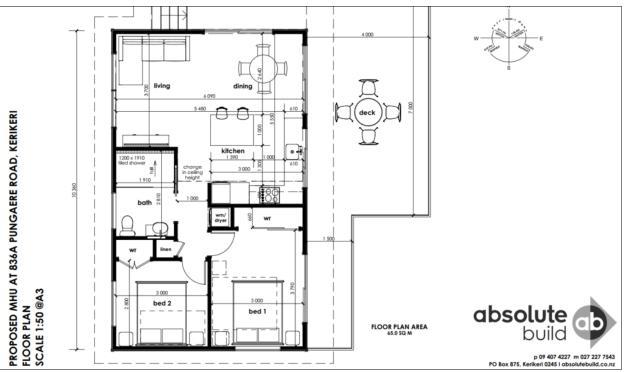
Screenshot of the Floor Plan from the supplied architectural drawings.
